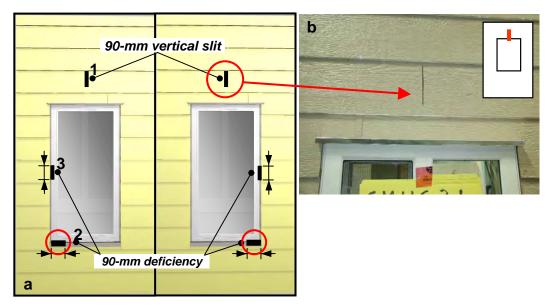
(a) Schematic of front elevation of 2.44-m by 2.44-m specimen (cladding exterior) showing nominal location of 90-mm deficiencies (missing sealant, backer rod at specimen face); (b) picture of 90-mm slit located (deficiency 1) above window of Specimen W2 – icon relates to test Trial description (Trial 3).
